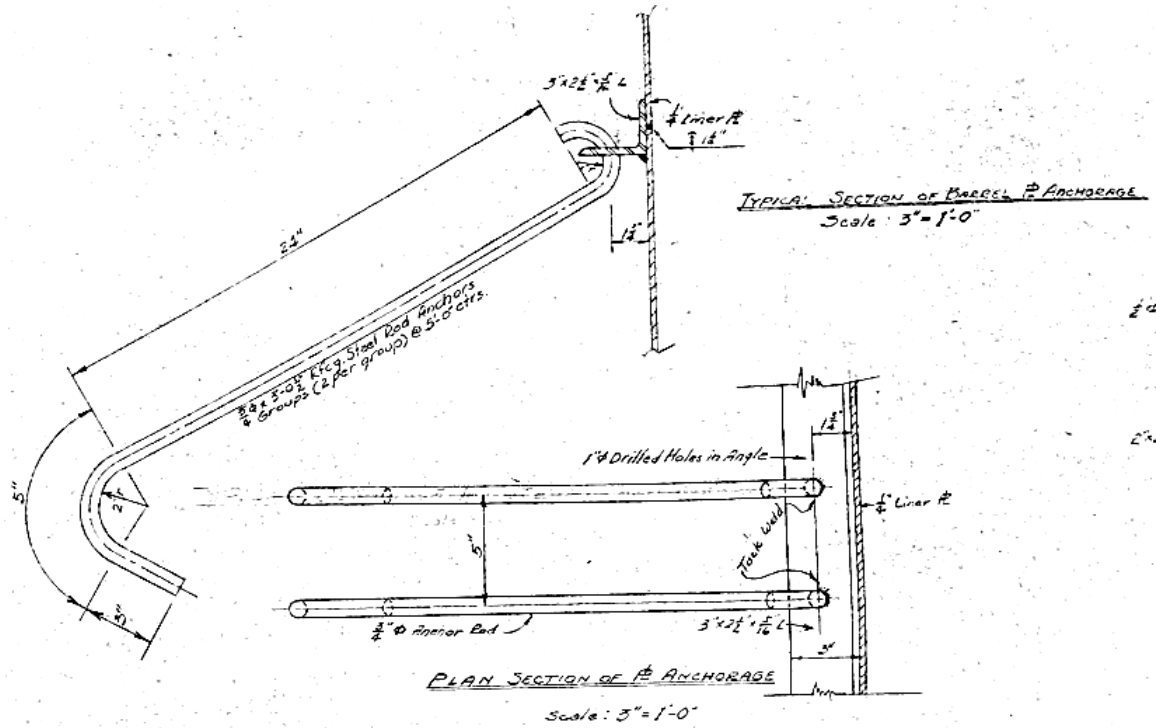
Typical Tank Barrel Section Reinforcement Details
